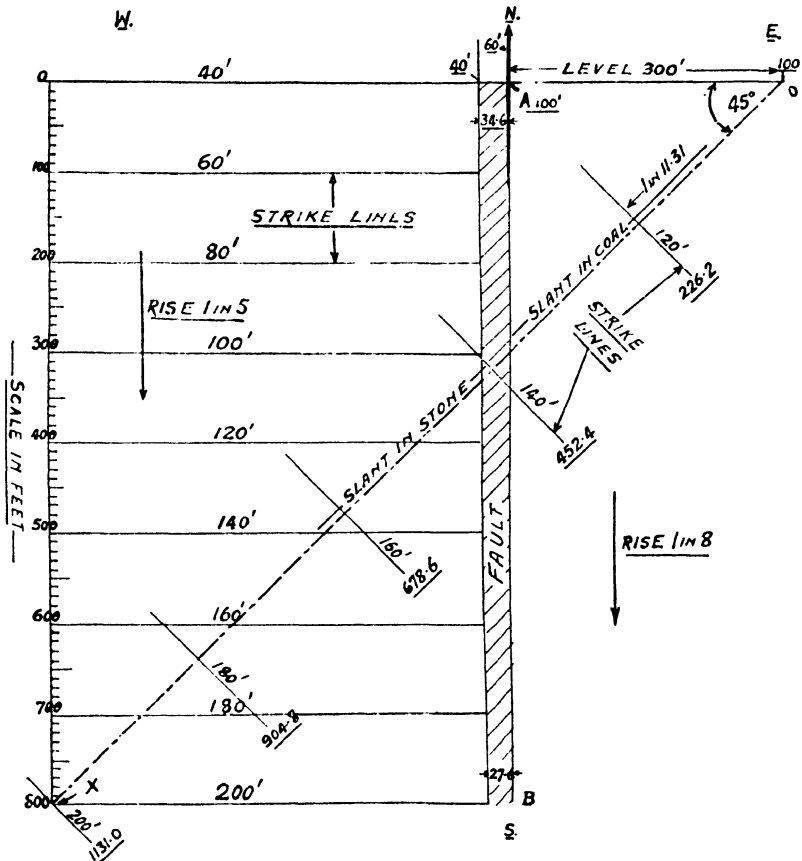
Plan showing Length of Slant Road to Intersect Seam.
